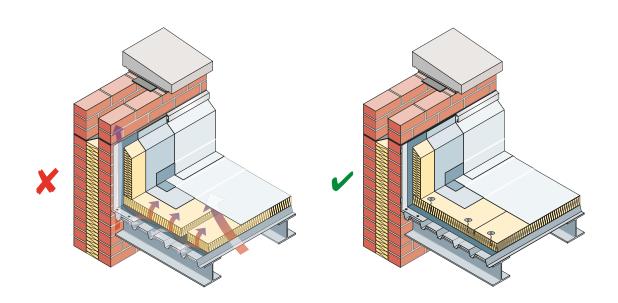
To avoid heat losses via the roof construction, ensure the deck insulation boards are tightly butted together and preferably mechanically fixed. The perimeter metal should also be sealed to the perimeter wall to prevent ingress at the rear.
